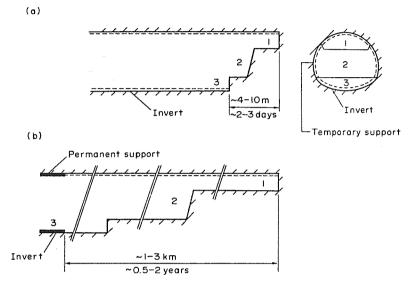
Placement of the invert arch: (a) subway close to the face and (b) deep tunnel at great distance from the face
